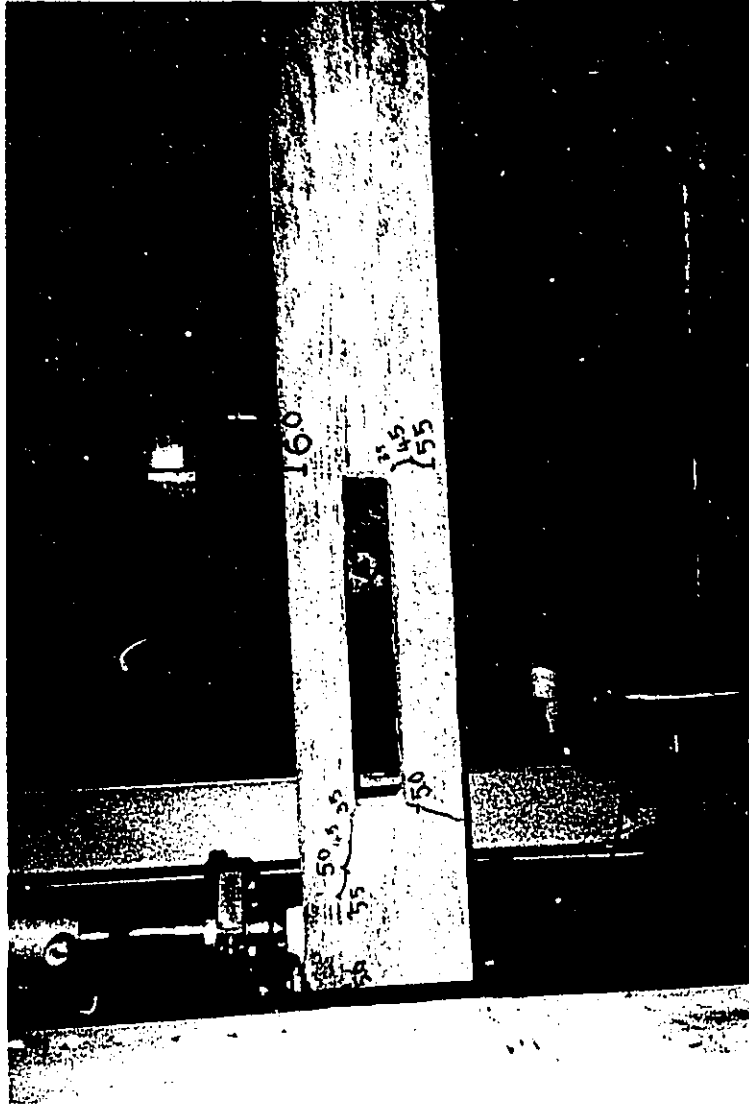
b CRACK PATTERN FOR BEAM BI3C
